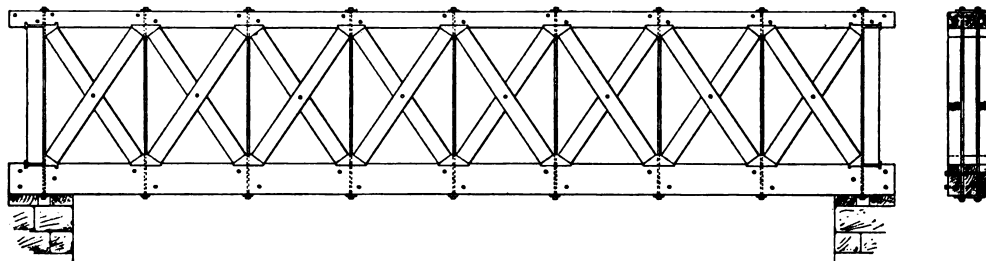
Elevation and Cross Section of Truss of 25 Feet Span.—Scale, 3-16 Inch to the Foot.
